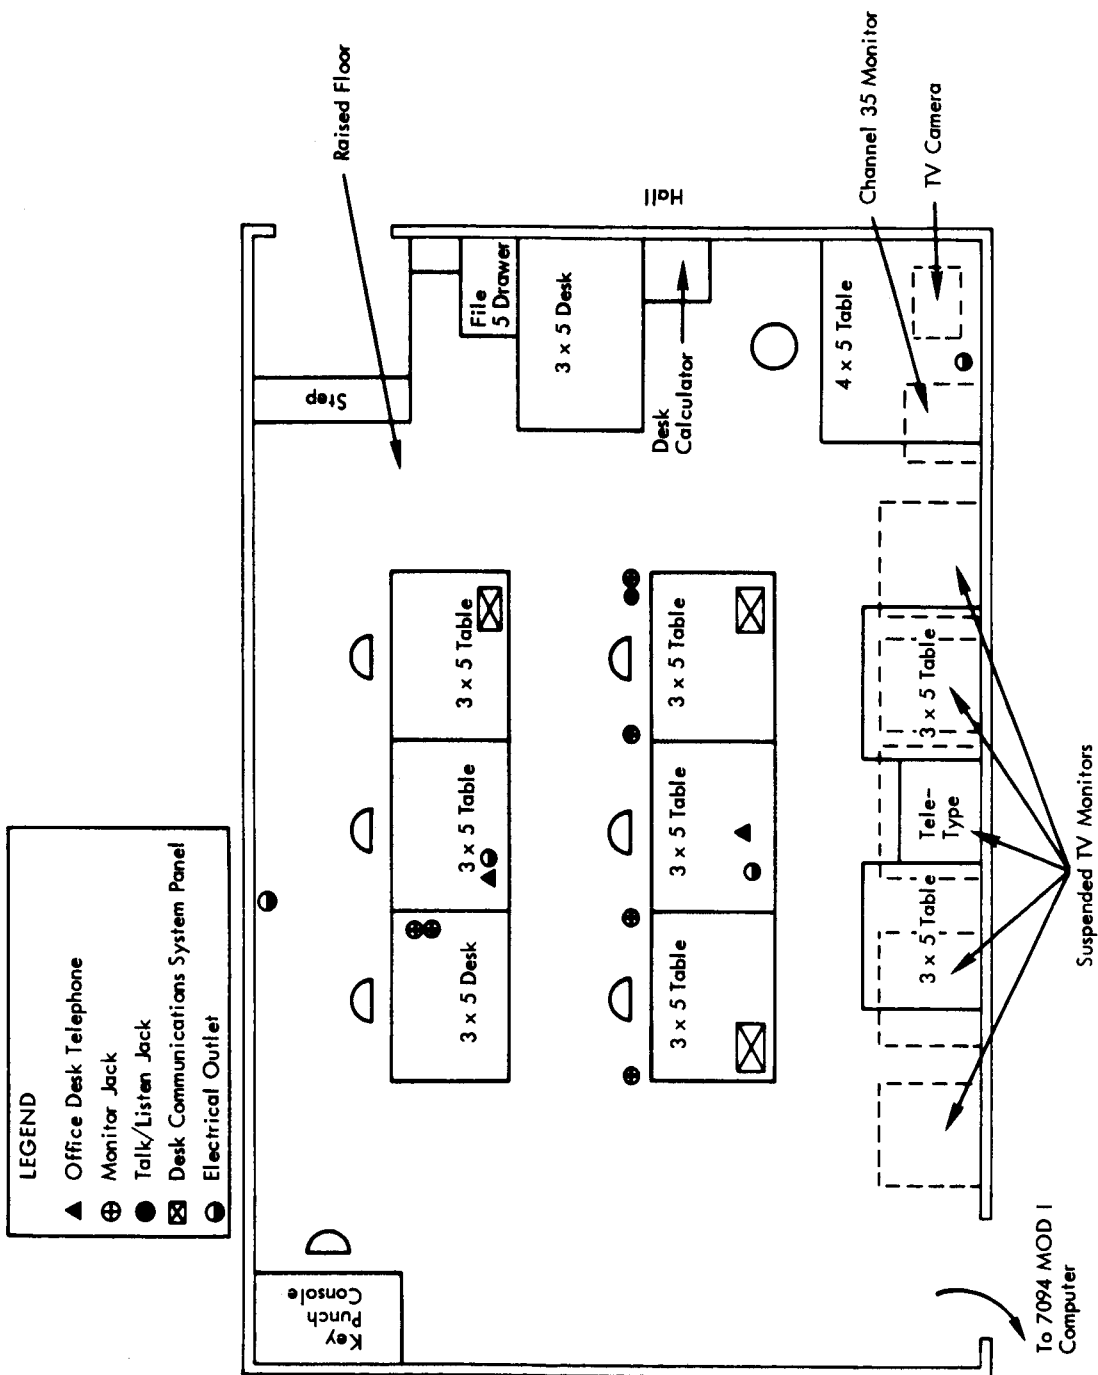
Auxiliary Computing Room Floor Plan, Room 3052-C, Building 30
